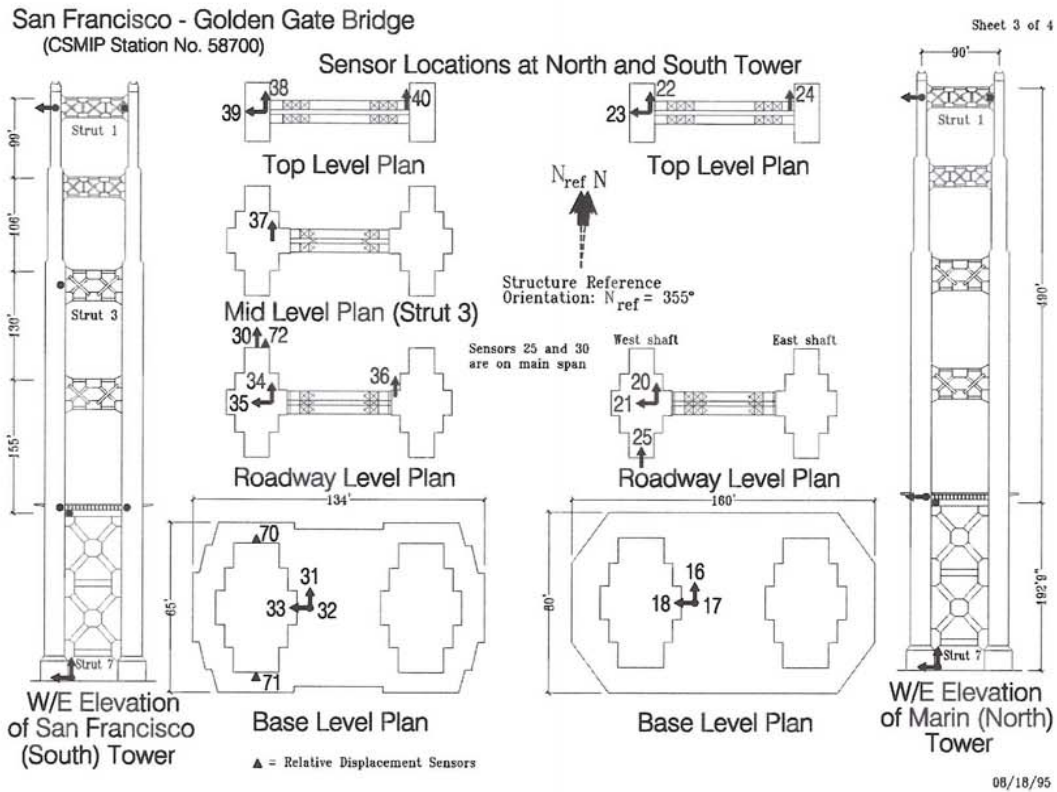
Drawing showing locations of strong motion instrumentation near north and south towers of the Golden Gate Bridge.
